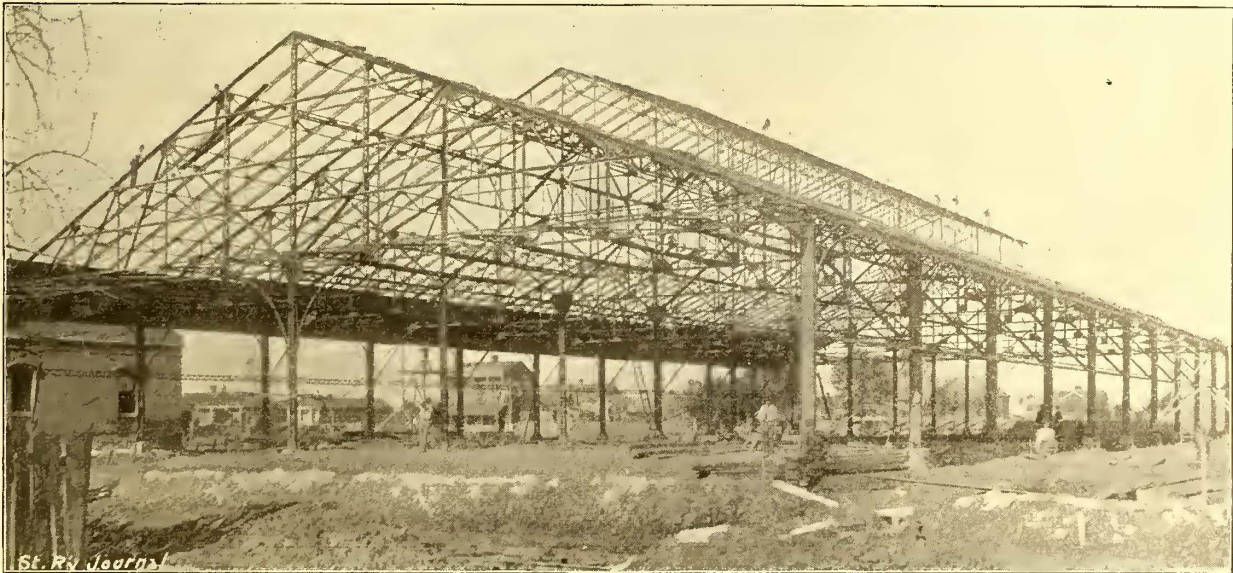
CAR HOUSE OF THE NEW ORLEANS & CARROLLTON RAILROAD IN PROCESS OF CONSTRUCTION.
